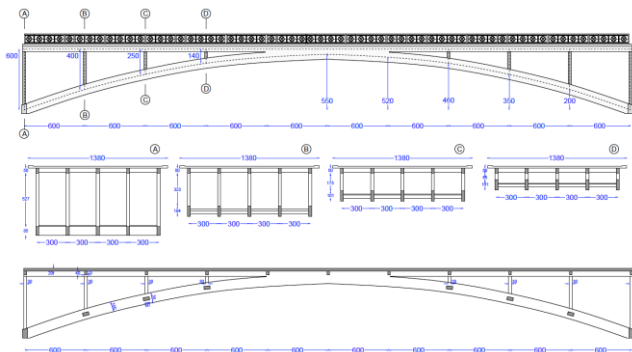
RC arch bridge: elevation, transversal and longitudinal sections.
